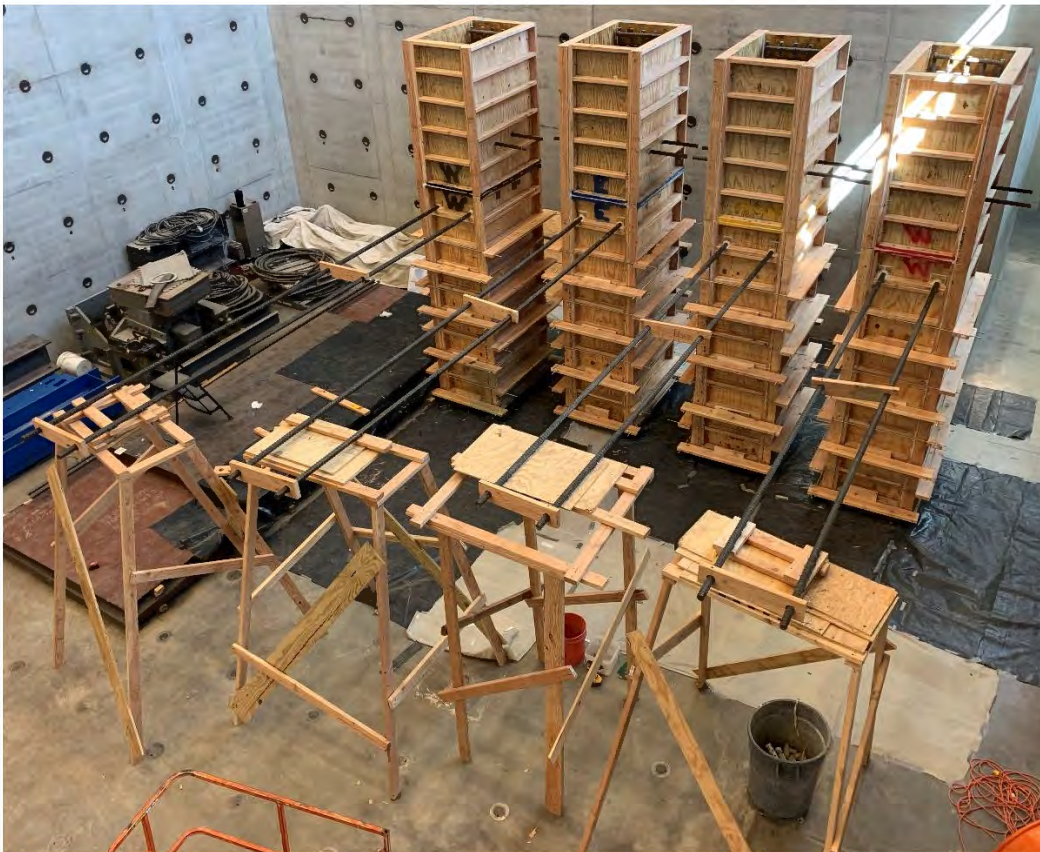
Vertical formwork for No. 14 bar specimens and sawhorses to hold the bars
